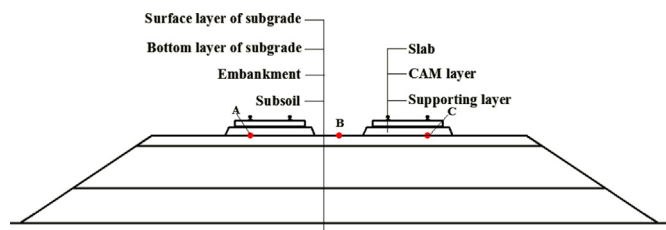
Cross section of the Beijing-Shanghai double-line low-embankment high-speed ballastless slab track railway.
